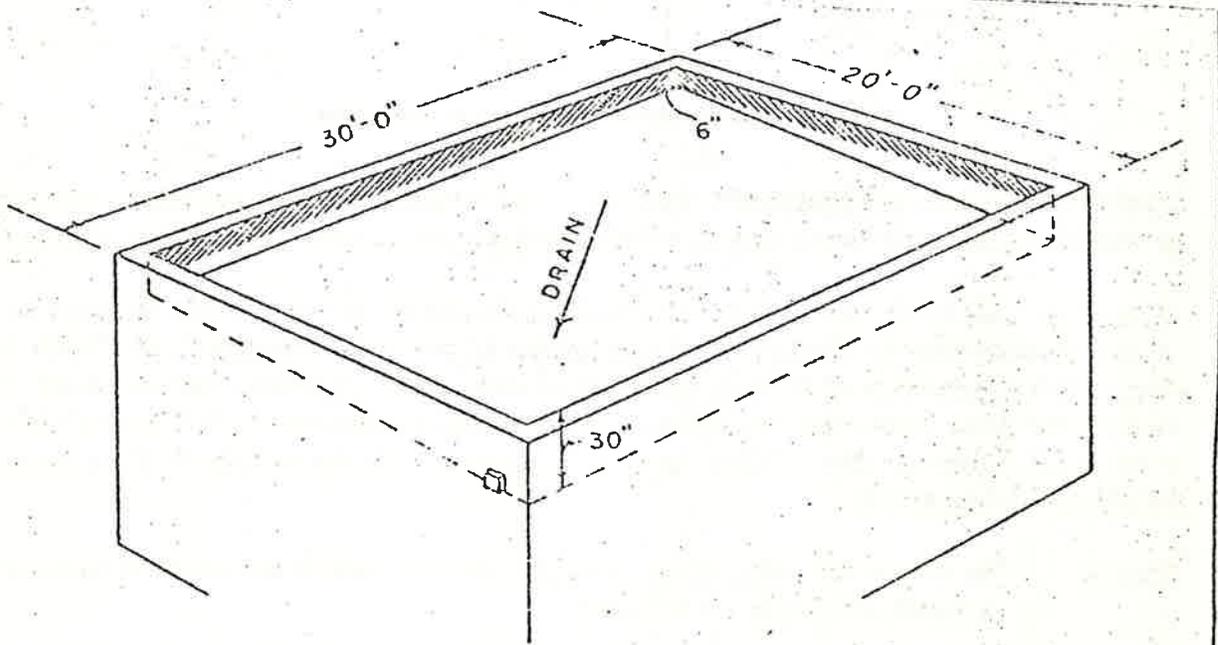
Flat roof Sloping to within 6" of Top Edge of Parapet Wall
